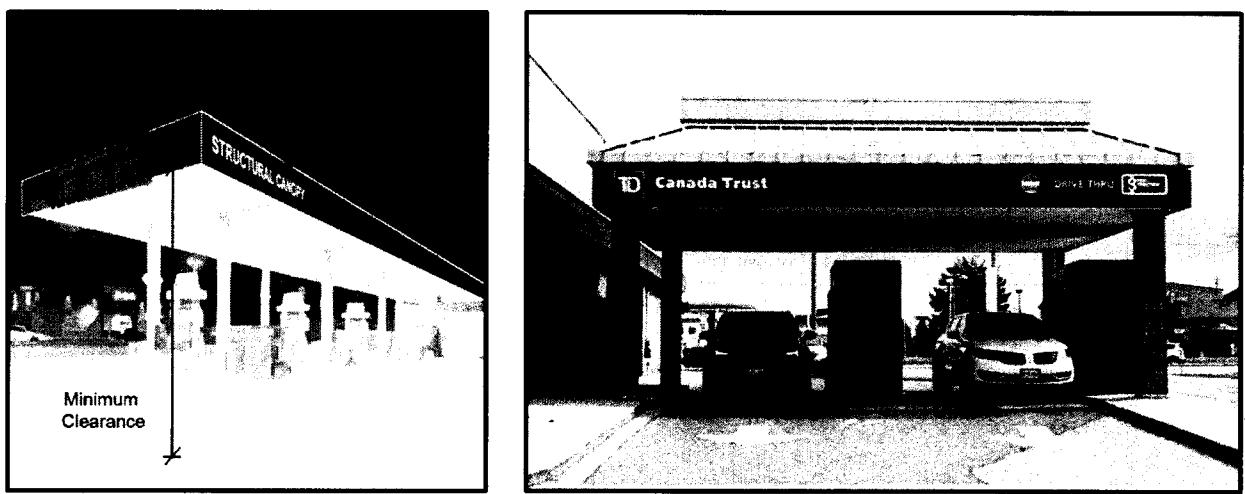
H: Structural canopy sign measurement locations and sample signs
